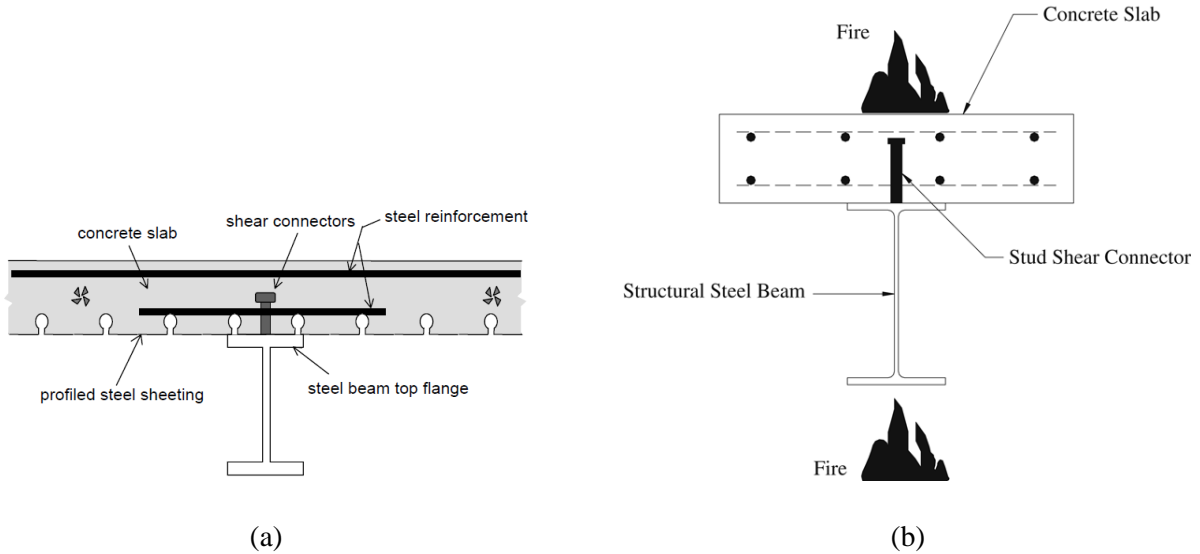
Cross-section of composite steel and concrete connection by headed studs (a) with profiled steel sheeting (*Shariati et al.*, 2012) and (b) concrete slab subjected to fire (*Mirza and Uy*, 2009).
